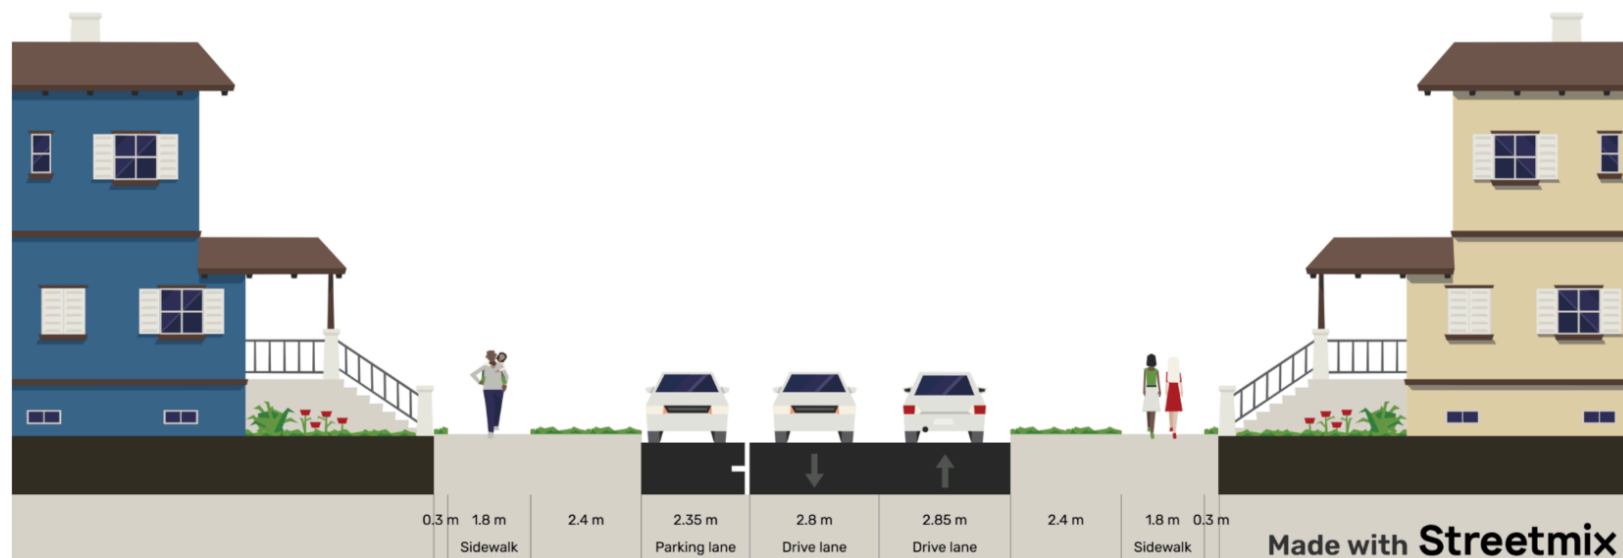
Local Road Option 2 - 17m ROW, 9m Road with 1.8m Boulevard walks
